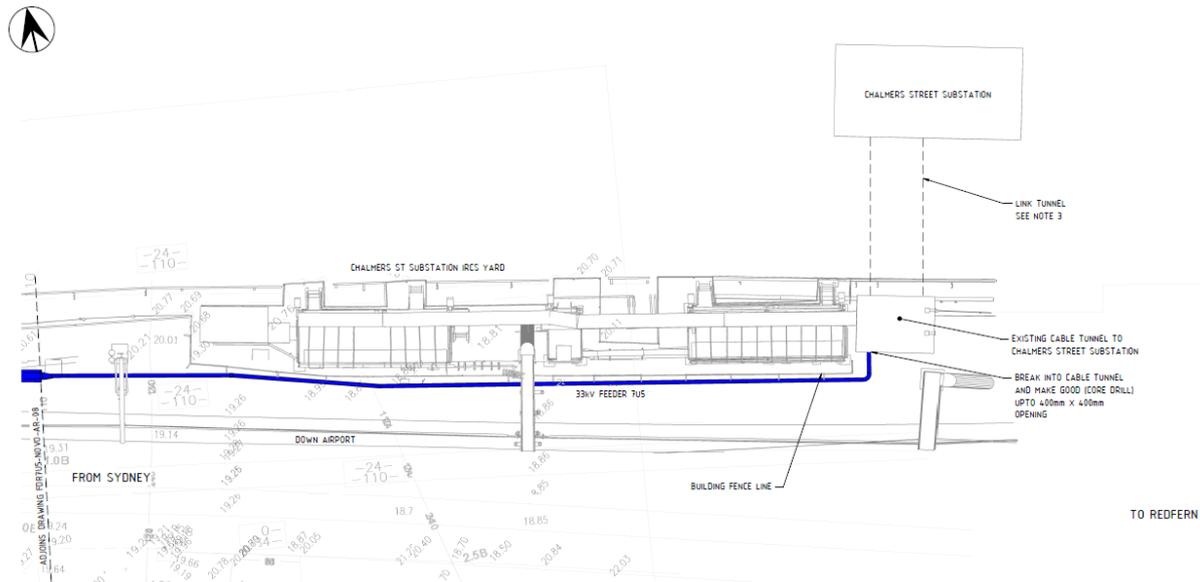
Proposed GST installation (blue) at the southern end of the study area. The cabling will be fed from the Chalmers Street Substation through an existing cable tunnel then connected to the GST. The GST will be fixed using a combination of free-standing posts and brackets attached to existing structures/existing GST. (Source: Novo Rail, 2019)
